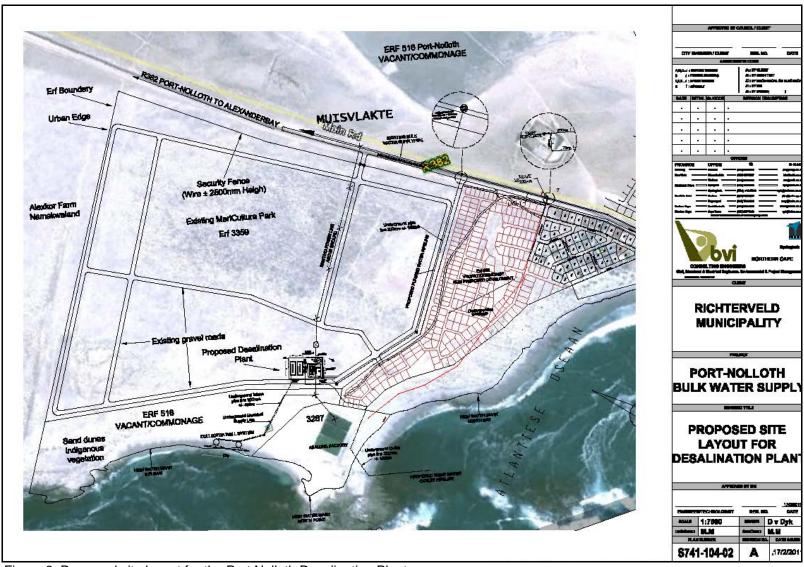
Proposed site layout for the Port Nolloth Desalination Plant
